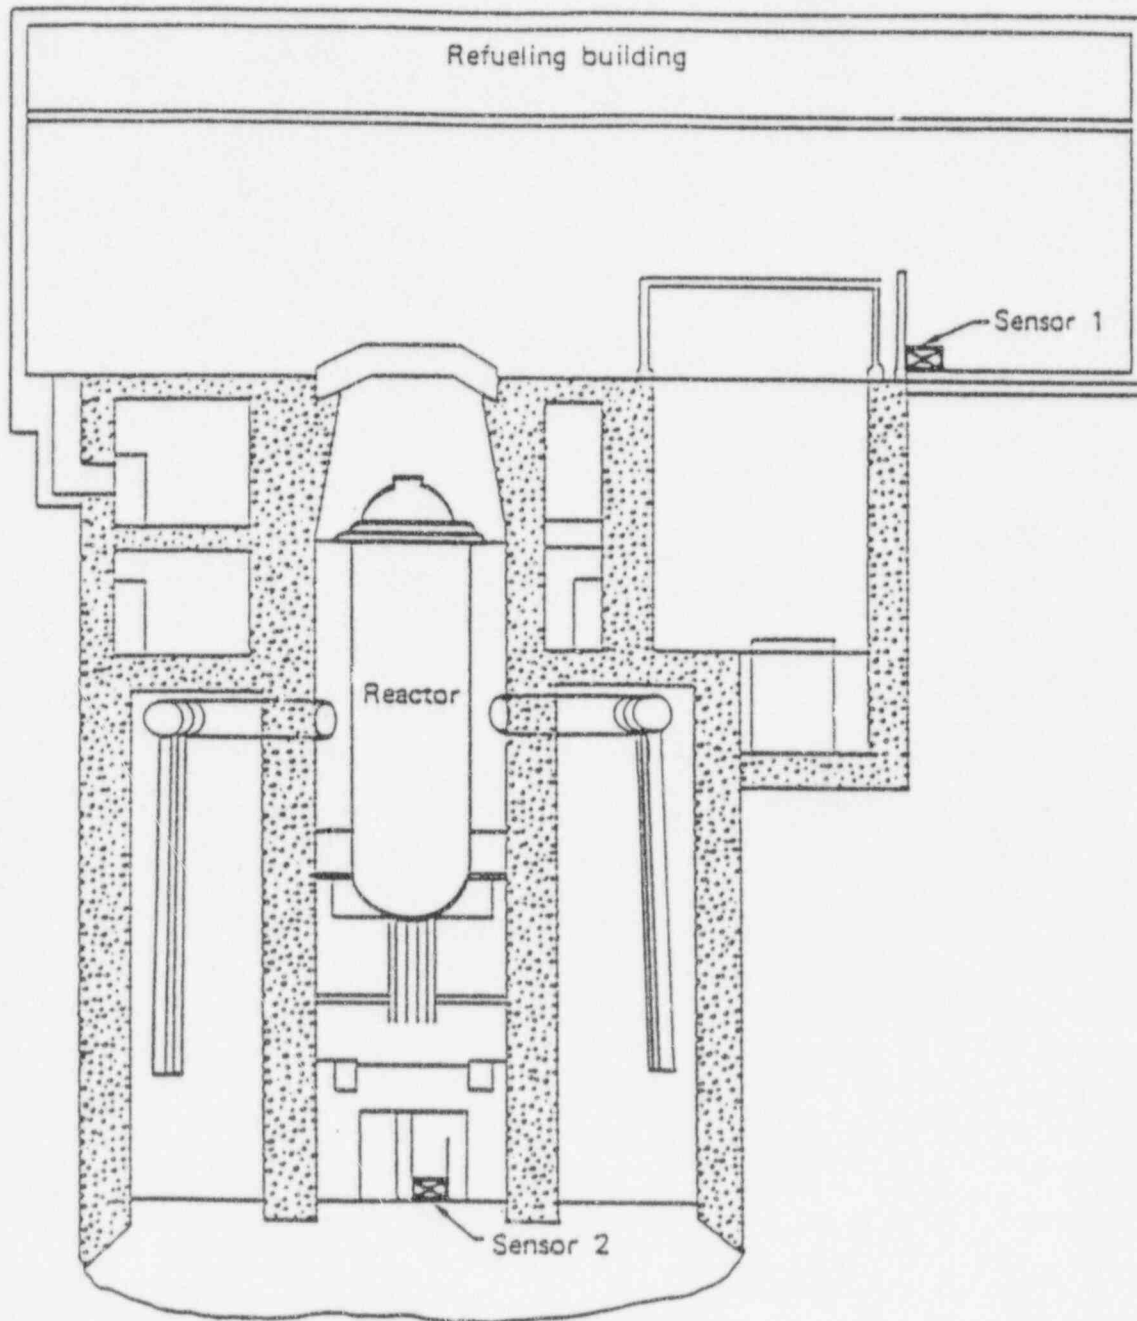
Elevation View of Refueling Building, Facing North, Showing Location of Strong Motion Accelerographs
